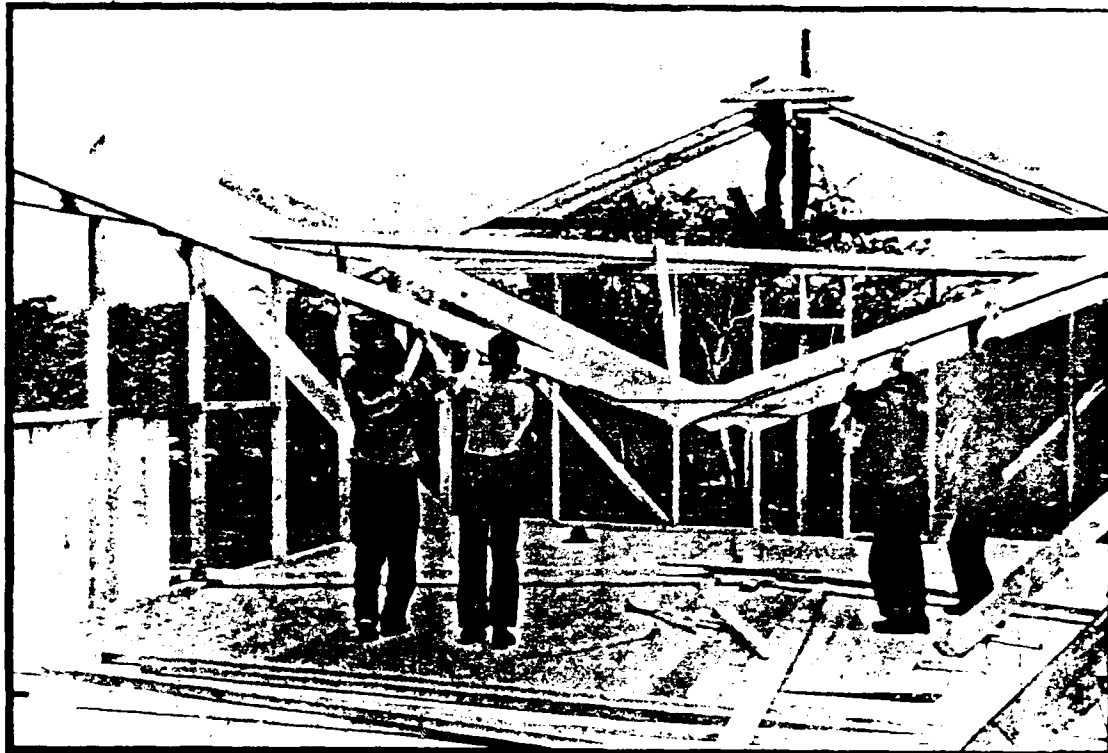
RAISING BARRACKS ROOF RAFTERS, CAMP MALAKOLE
